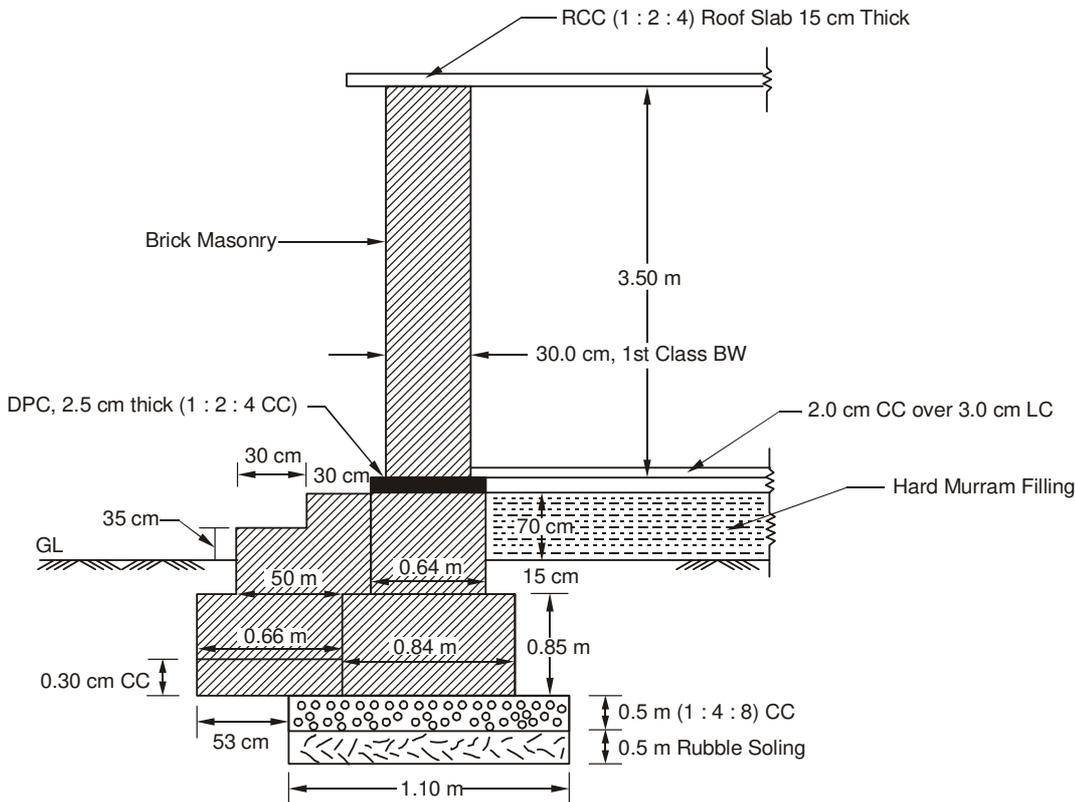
A Typical Cross-section Combining Steps and a Wall with Foundations (Example 3.2)
